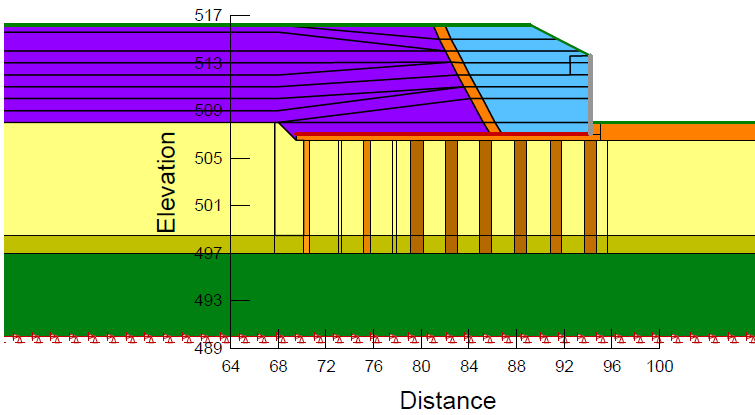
FEM South Abutment Profile Model Completed Stage
